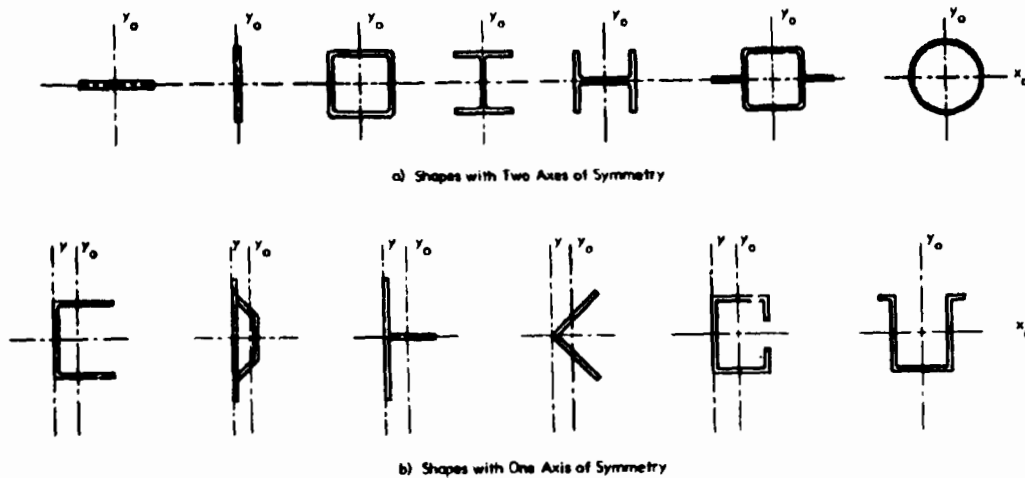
TYPICAL CROSS-SECTION SHAPES
